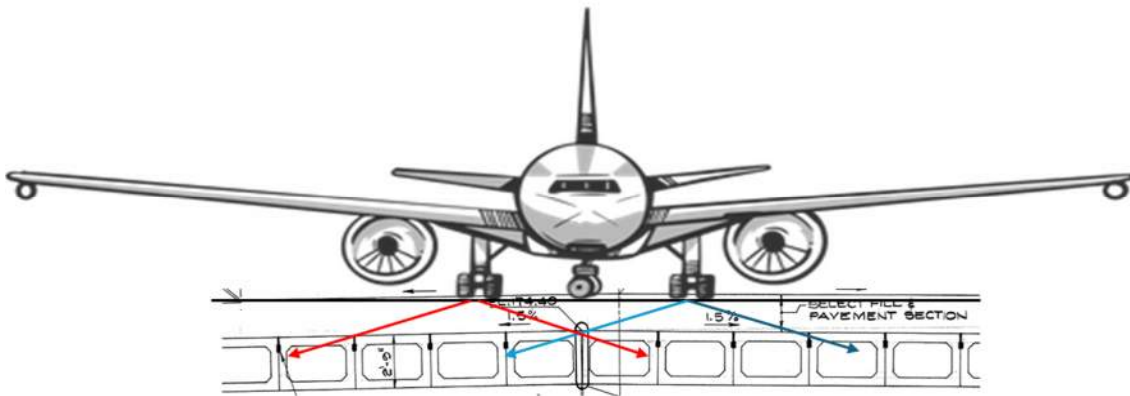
Strut Load Distributed to Box Beams Through Pavement and Soil Fill.
